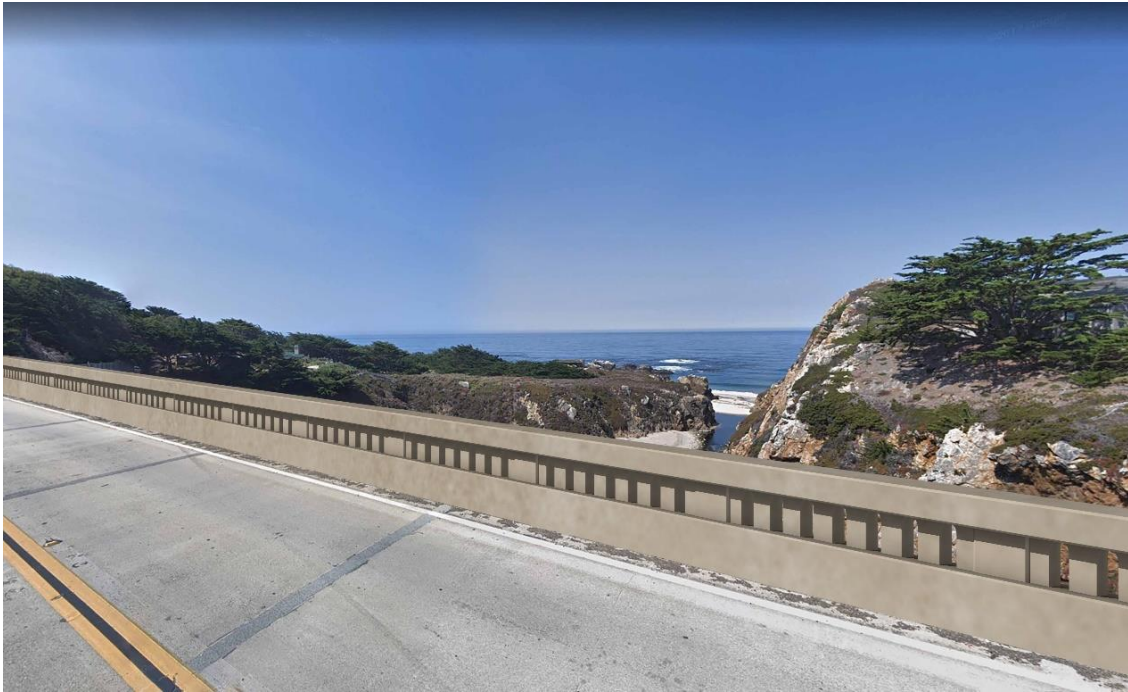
Photo of Existing Garrapata Creek Bridge Rail
